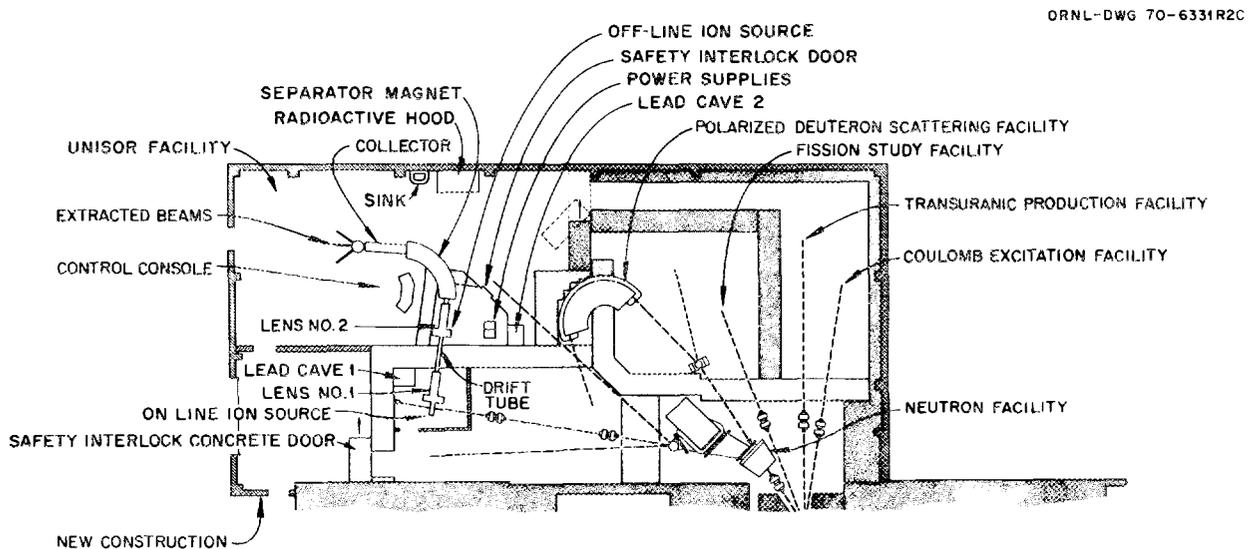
Additions to the ORIC building. The UNISOR facility is at the left.
